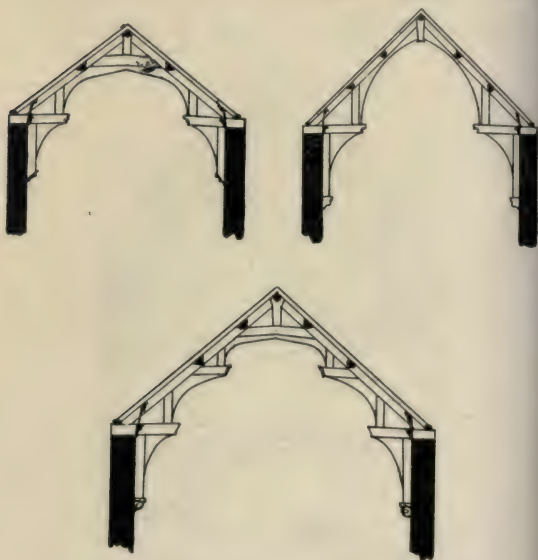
DIAGRAMS OF HAMMER-BEAM ROOFS
